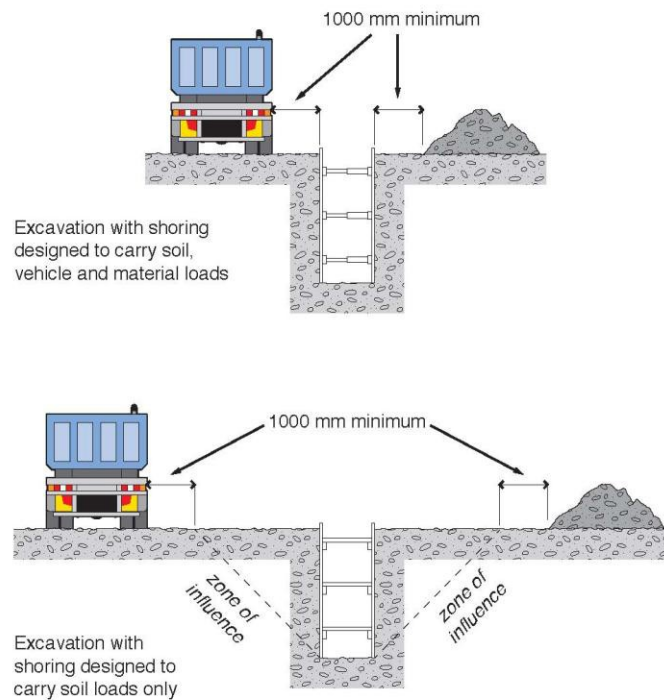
Suggested location of excavated load and plant in relation to the excavated worksite.
